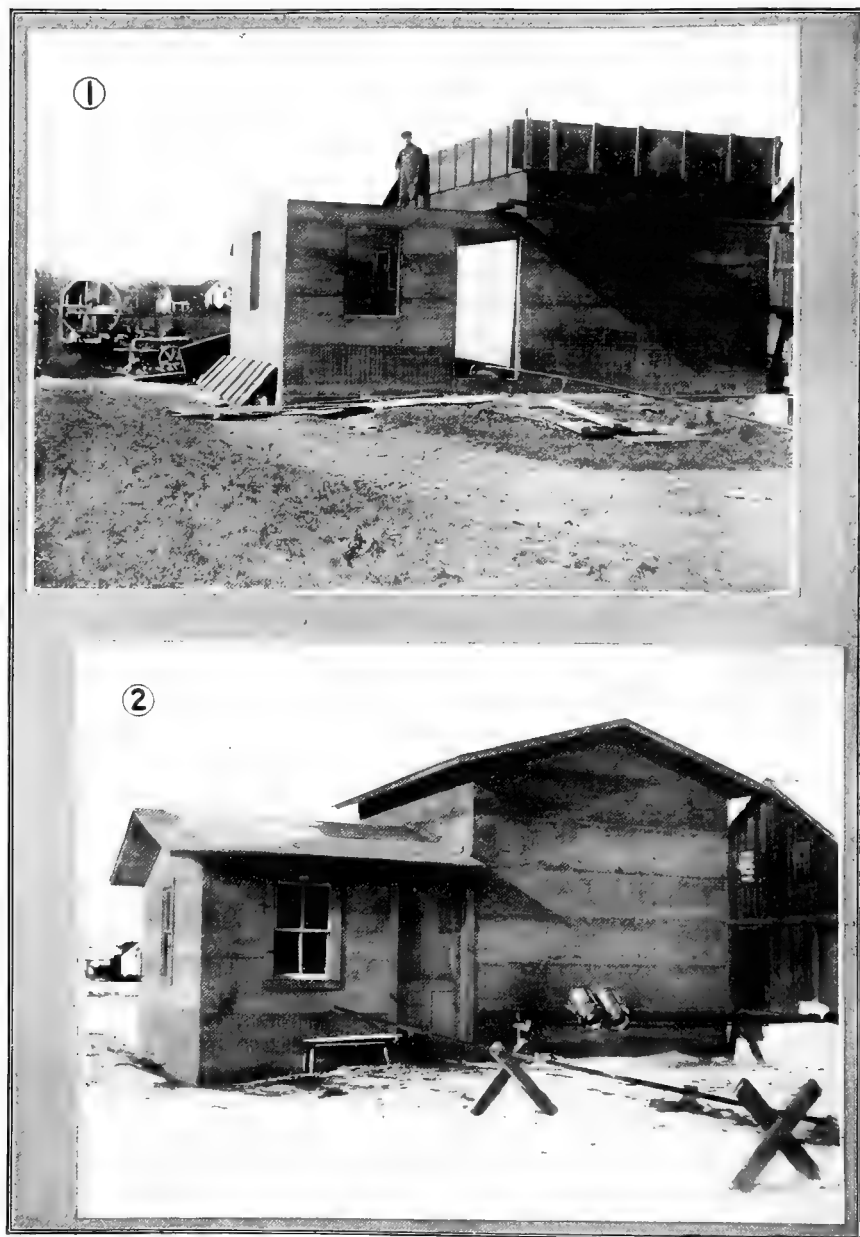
MONOLITHIC MILK AND ICE HOUSE.
